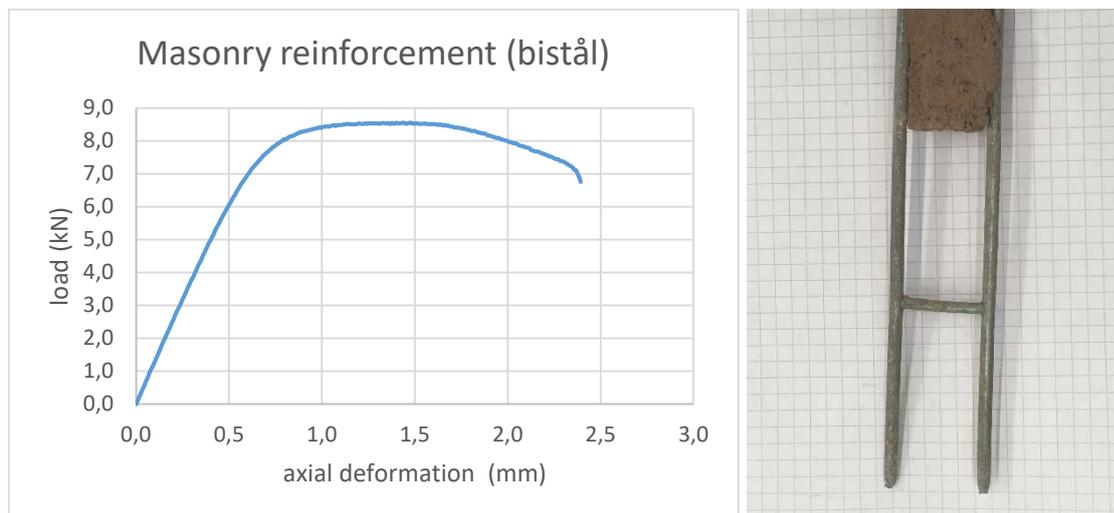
Masonry reinforcement (bistål). Load – axial deformation curve for one masonry reinforcement bar with $A_s = 12,5$ mm² (left); ruptured masonry reinforcement (right).
